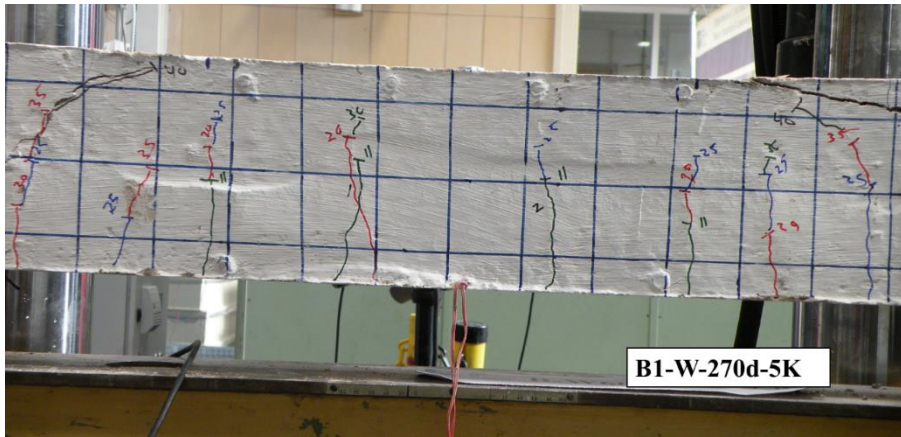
Crack pattern and failure mode of beam1 loaded and stored in conditioned in water at 60°C (B1-W-270d-5k).
